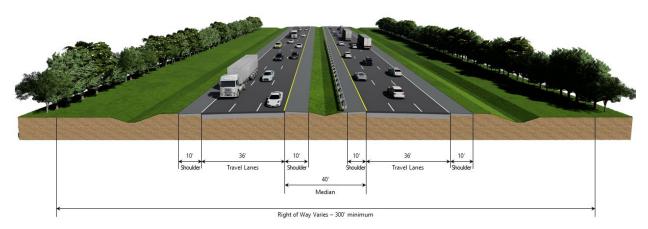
I-95 Typical Section from Southside Boulevard to J. Turner Butler Boulevard (SR 202)
